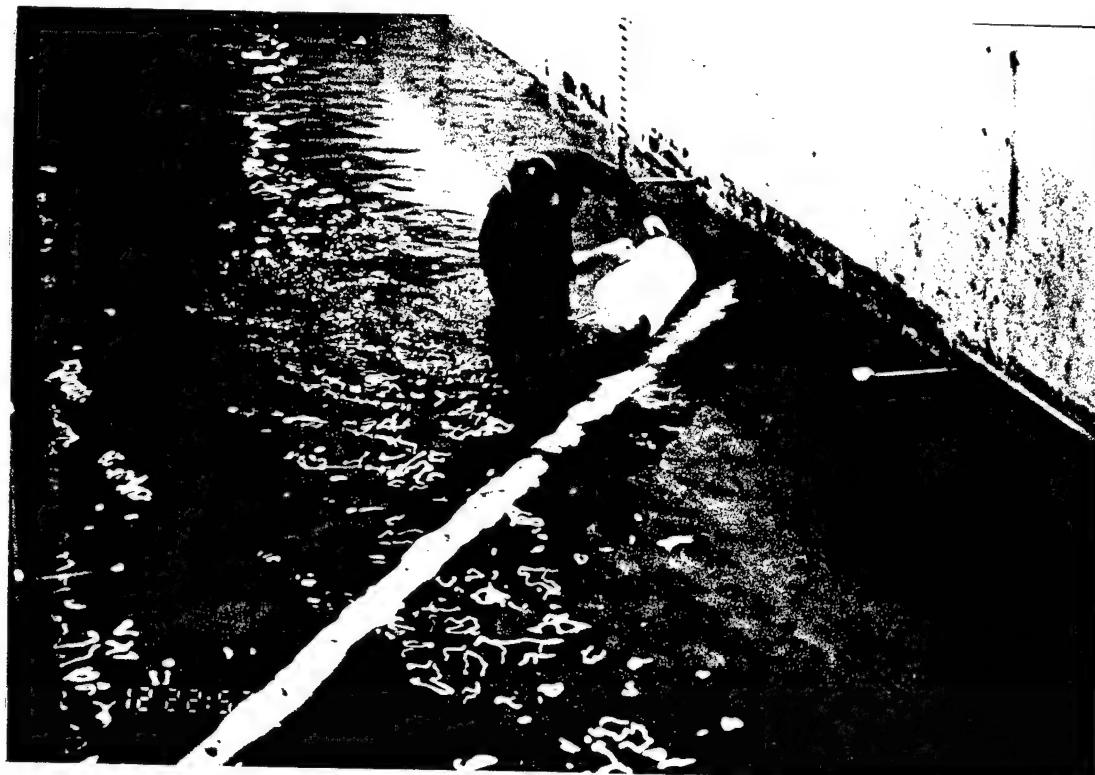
Placing of Armor Stone Design Mix Through Water
